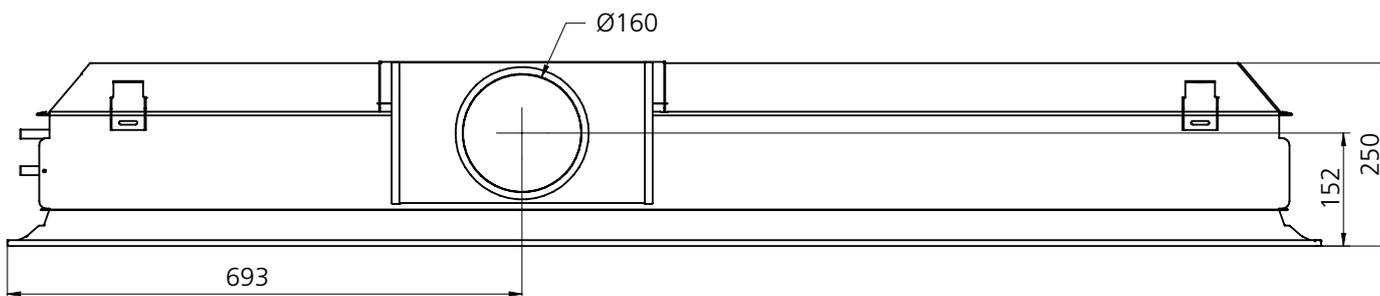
Dimensional drawing, side view. Air connection on the long side - pos 2.
